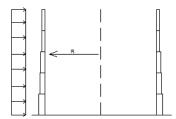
Uniform external pressure on a stepped wall cylindrical shell
